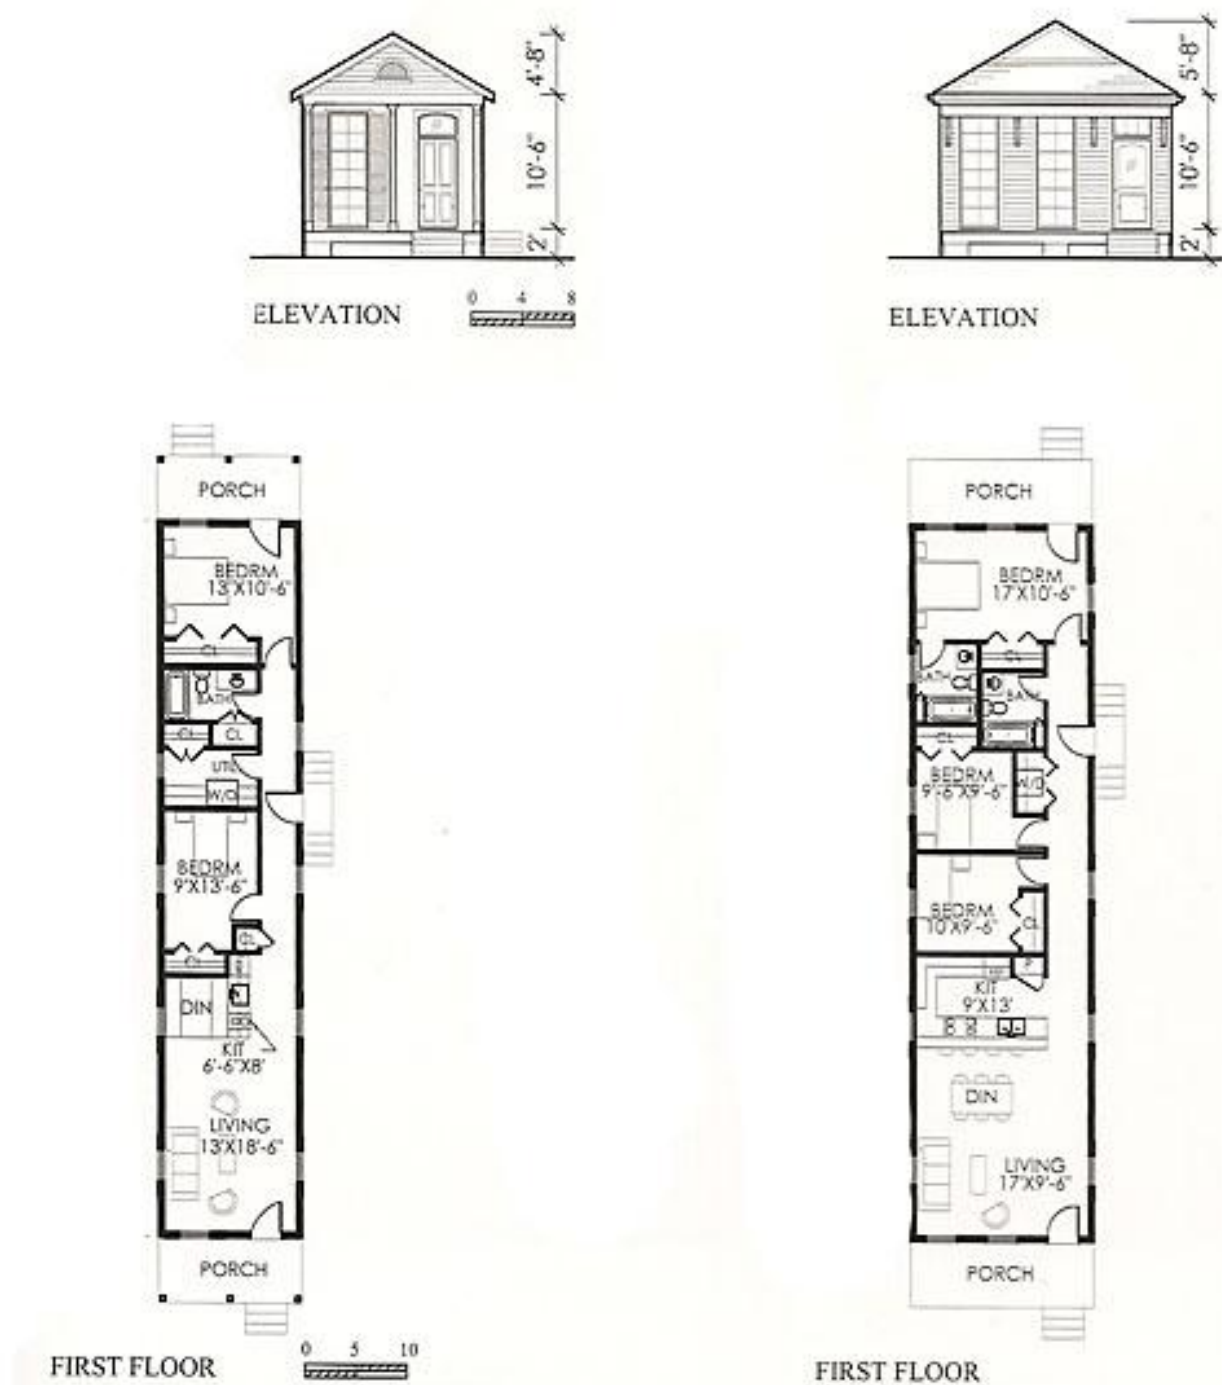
Examples of a standard, traditional two-bay (right) and three-bay single barrel shotgun house (left) in plan and elevation from Roulhac Toledano's *A Pattern Book of New Orleans Architecture*.
